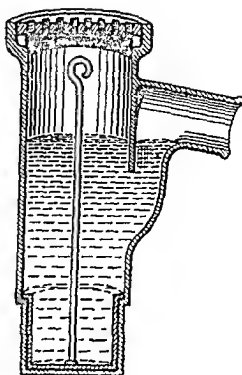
Dean's Gully Trap with a flat bottom and sediment pan.
